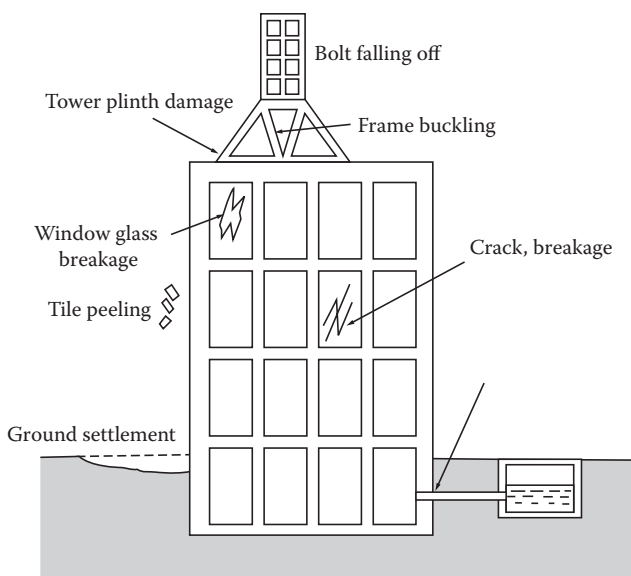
Typical damage of a building (Kobe earthquake).
